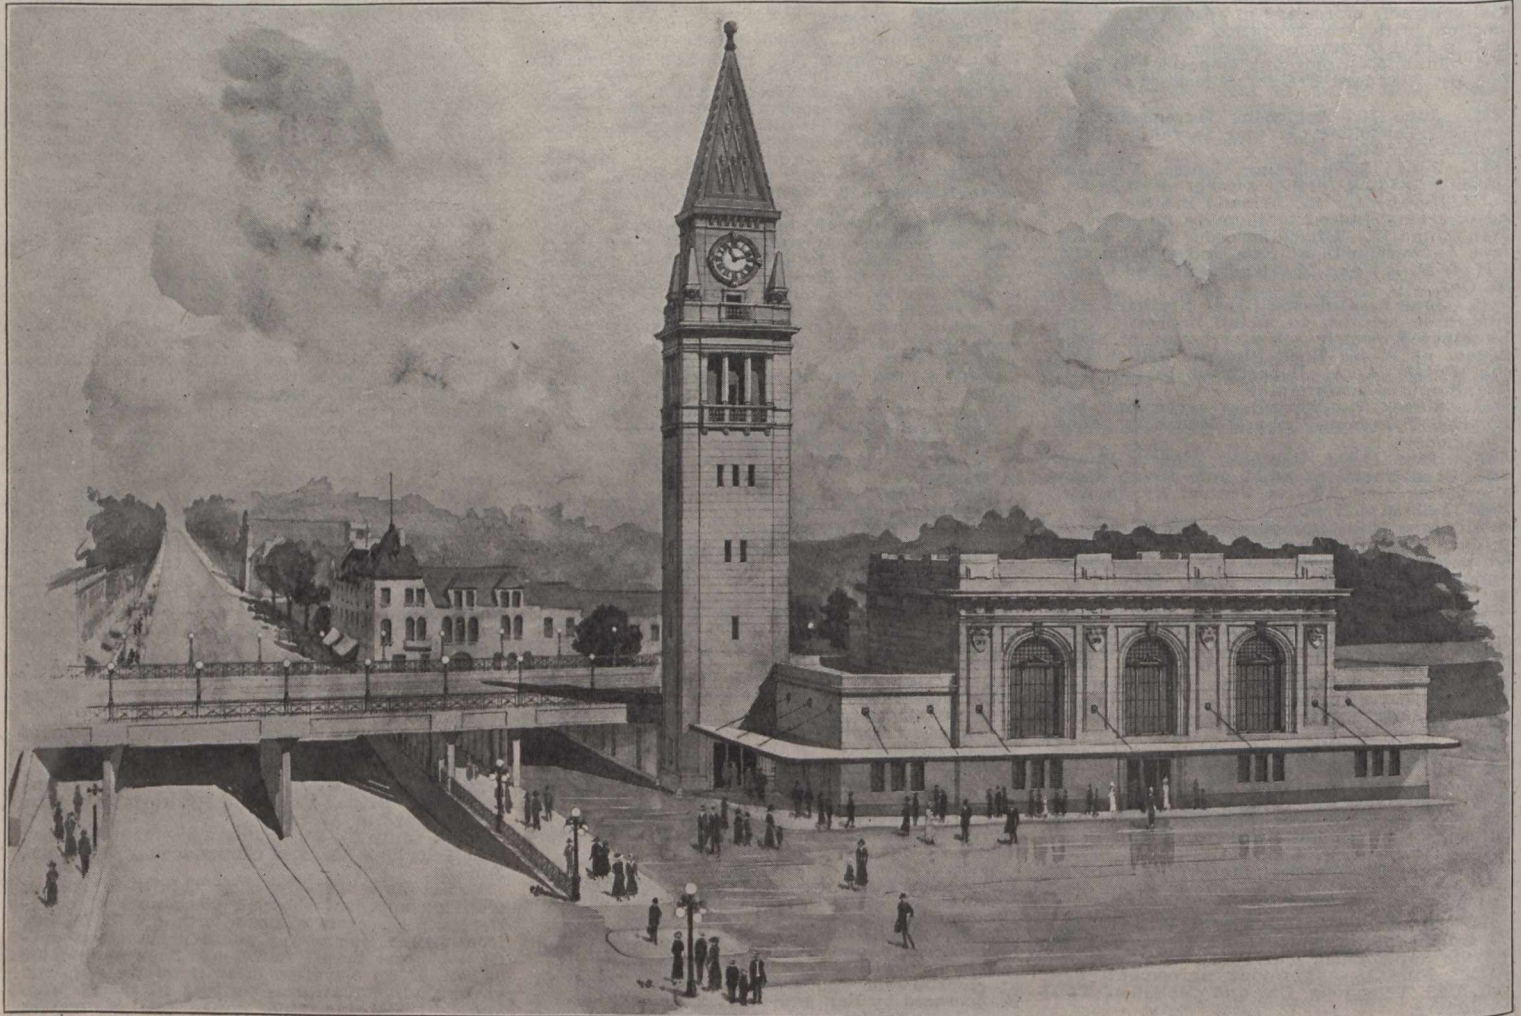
New North Toronto Station for Joint Use of Canadian Pacific and Canadian Northern Railways.
